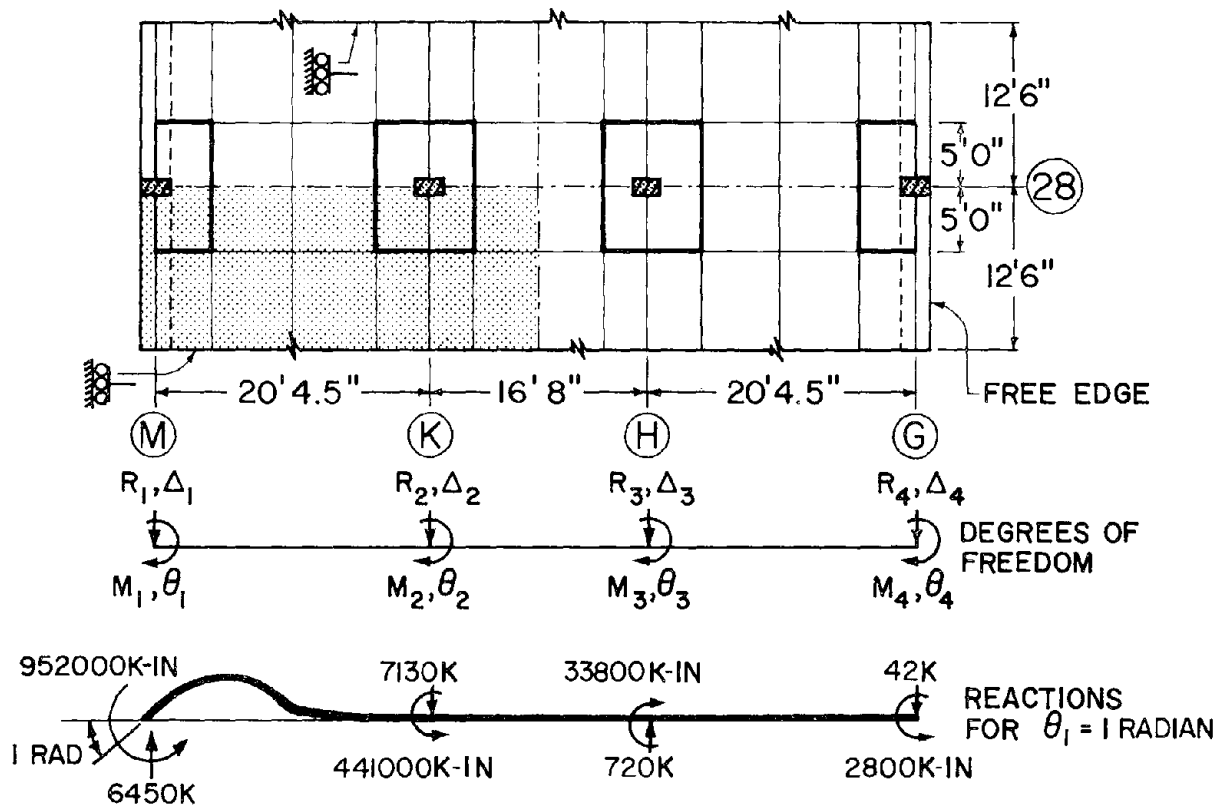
FINITE ELEMENT MODEL 1-FRAME 28 SLAB
